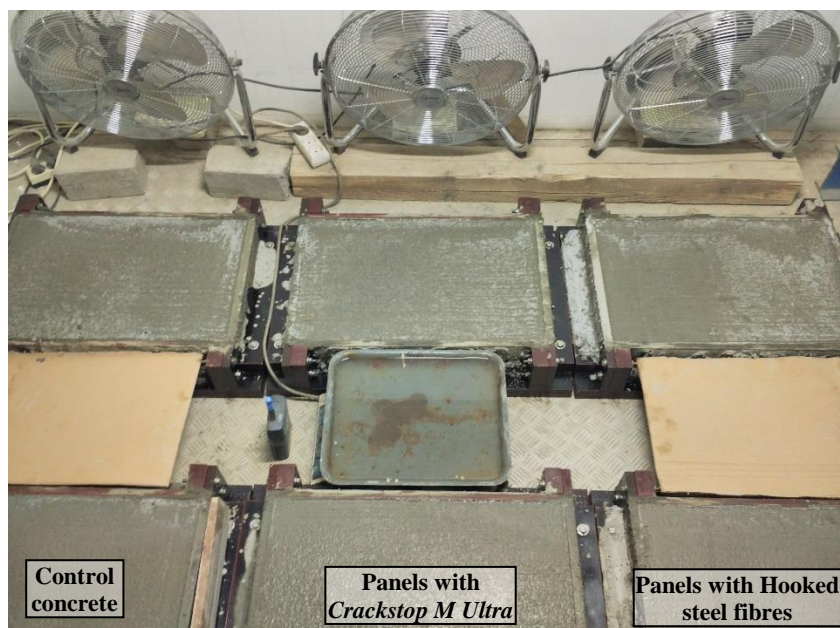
Specimens (from left to right): two control panels, two panels made of concrete with *Crackstop M Ultra* fibers, and two panels made of concrete with Hooked steel fibres
